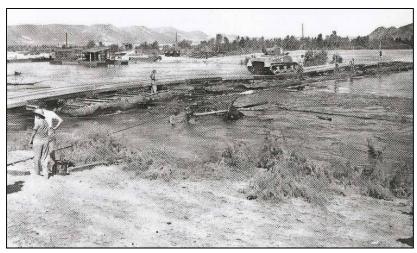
M-4 Tank crossing a Floating Bridge at the Yuma Test Branch
